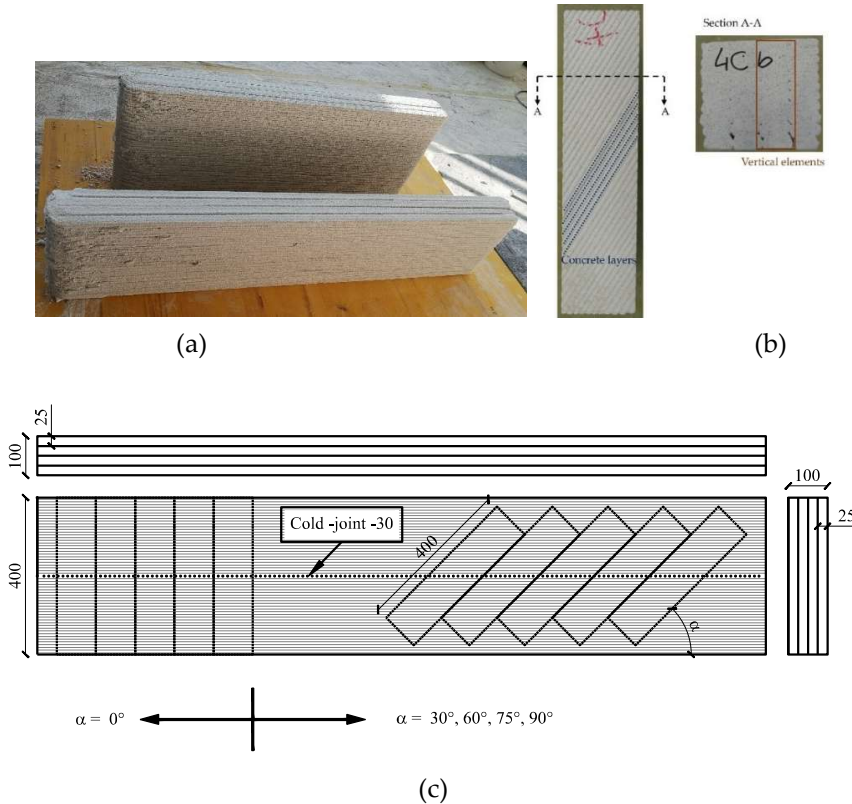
3D printed concrete walls with cold-joint: (a) companion specimen, (b) 3DPC specimen and (c) cold joint position.
